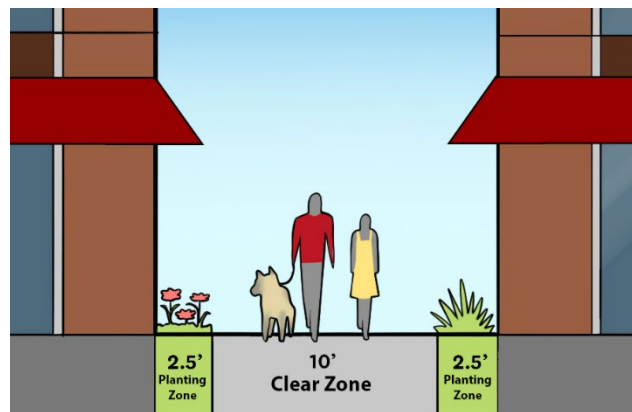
Internal Circulation Route Option 1 Cross Section
